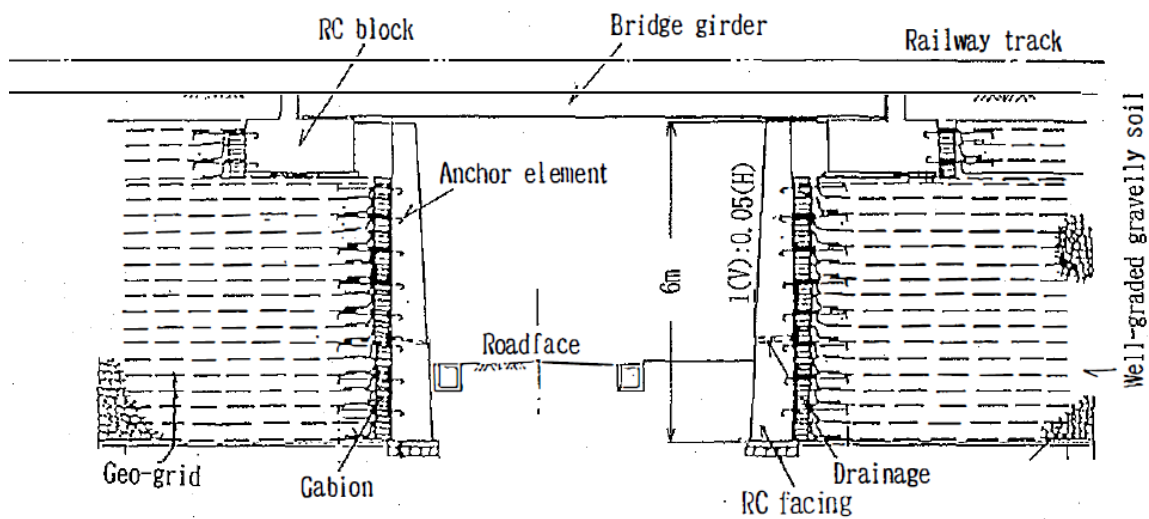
Cross-section of Nagoya Bridge (Kasugai and Tateyama 1992).
